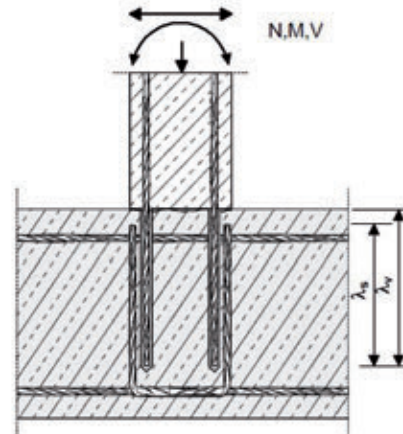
Overlap joint at a foundation of a column or wall where the rebars are stressed in tension
